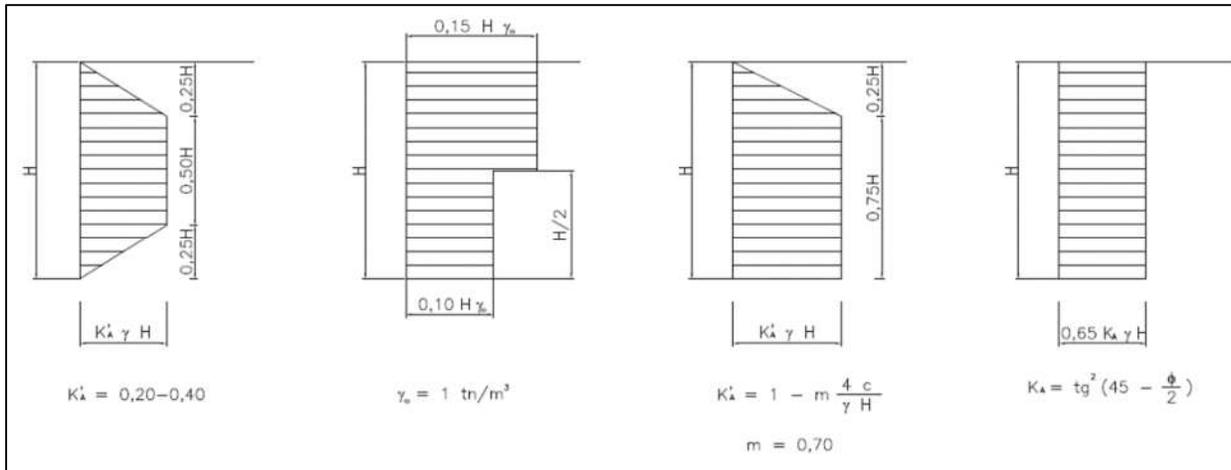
Code diagrams of minimum design earth pressures for strutted excavations
